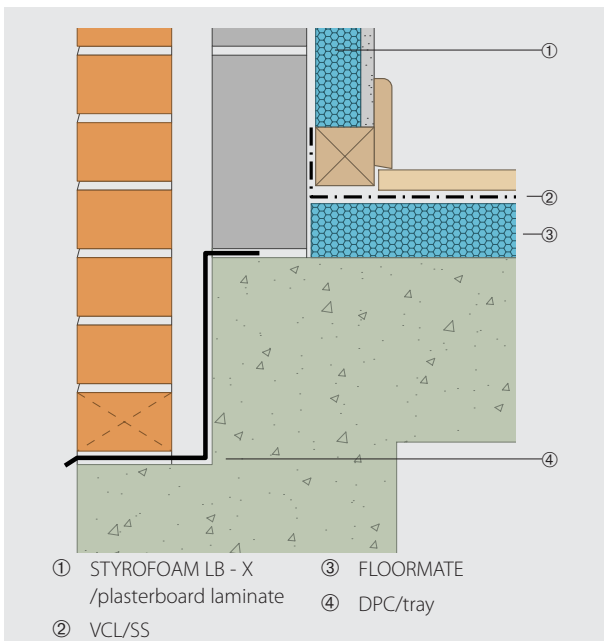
>> Exposed wall/floor junction, lightweight blockwork inner leaf
